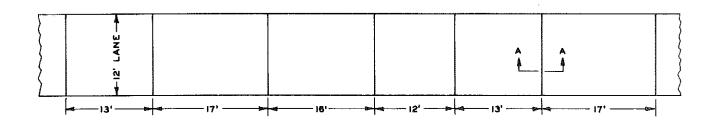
Type B, short slab, plain concrete, skewed joints, variable spacing, no load transfer, porous base, neoprene seal.
